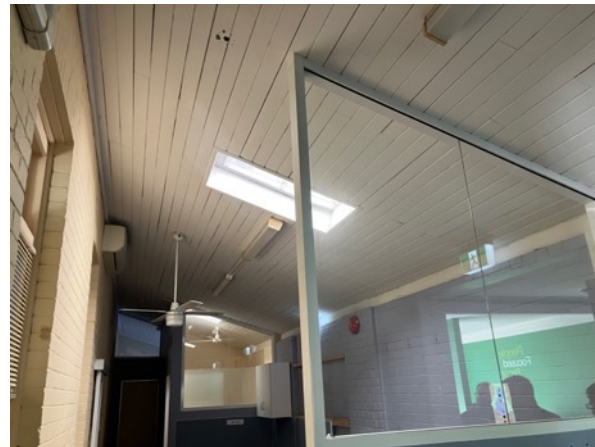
Evidence of original fabric within the enclosed verandah to the classroom building, which has been painted and accretions added.
